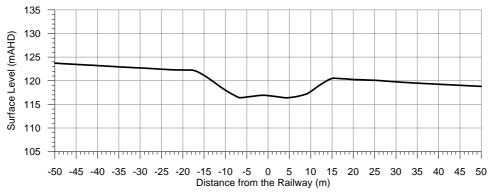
Cross-section through Cutting 76.6 km – Looking East (Up Track)
